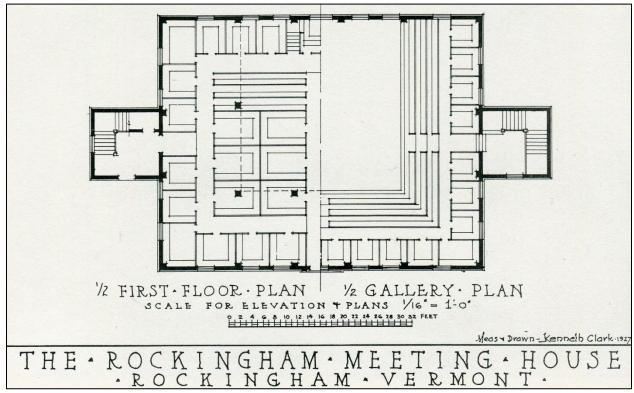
1927 Floor plans of the Rockingham, Vermont Meetinghouse by Kenneth Clark illustrating what the interior layout of the New Hampton Town House may have originally looked like.
